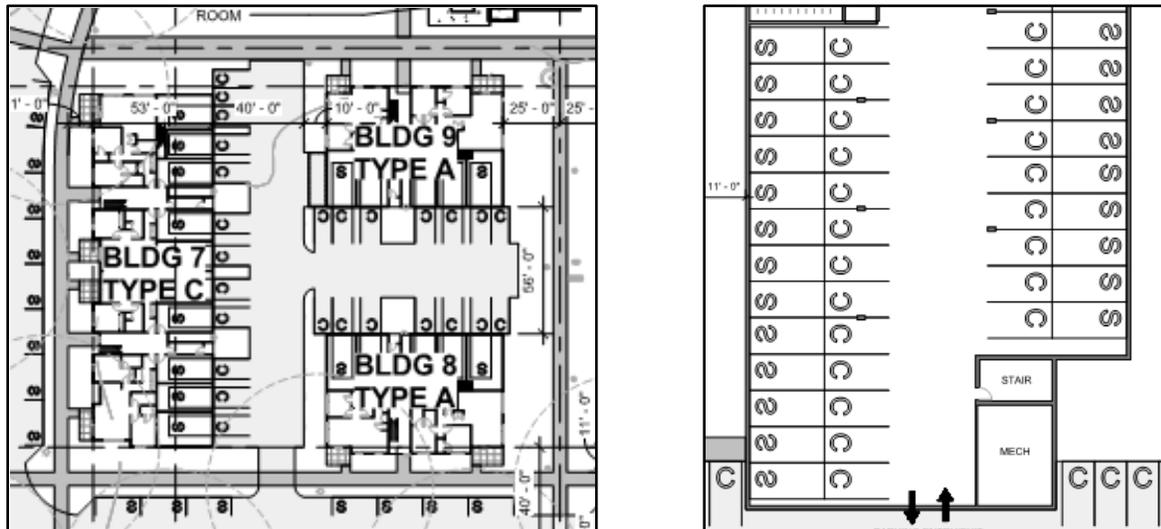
Typical tandem stall configurations for the 3-story building (left) and the 5-story building (right)
